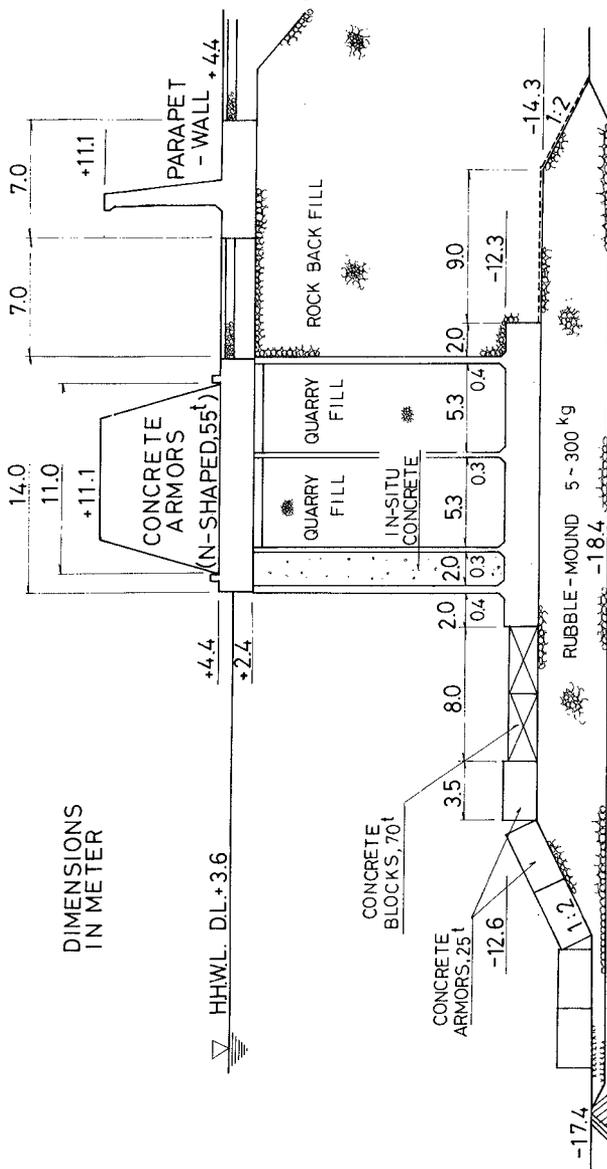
Seawall of Concrete Caisson with a Parapet Wall and Armor Blocks on the Top
